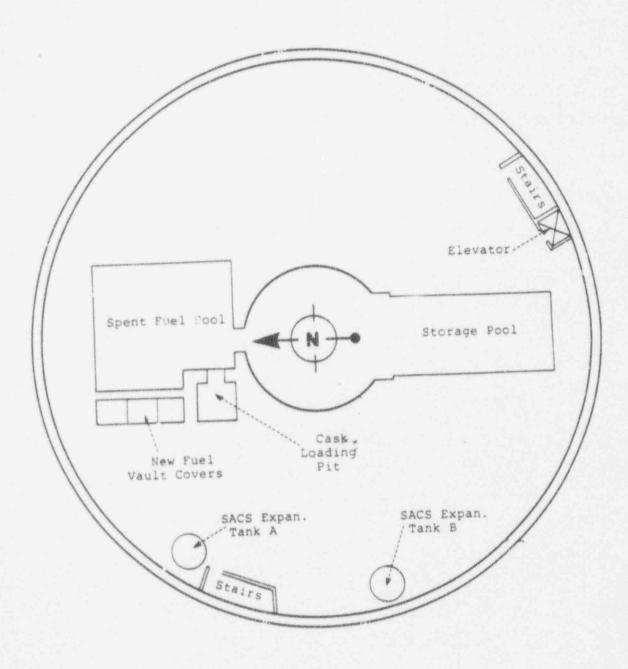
Reactor Building Enclosure Boundary Outline Plan at Elevation 201'-0"
